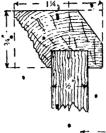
Moulding for Top of Overdoor Pediment.
